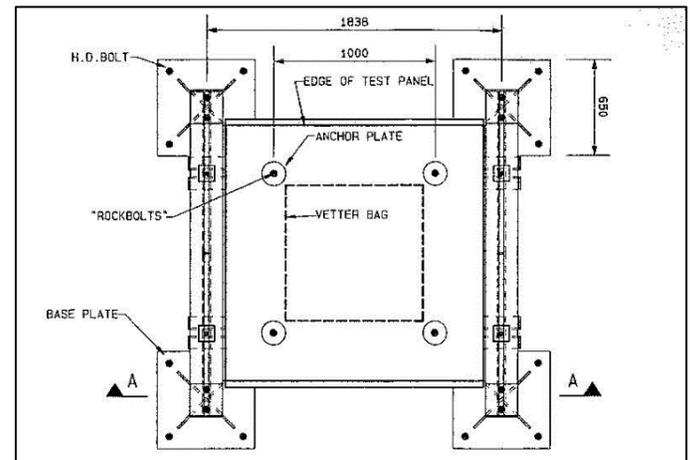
Plan view of panel testing frame, after Kirsten [1993].
